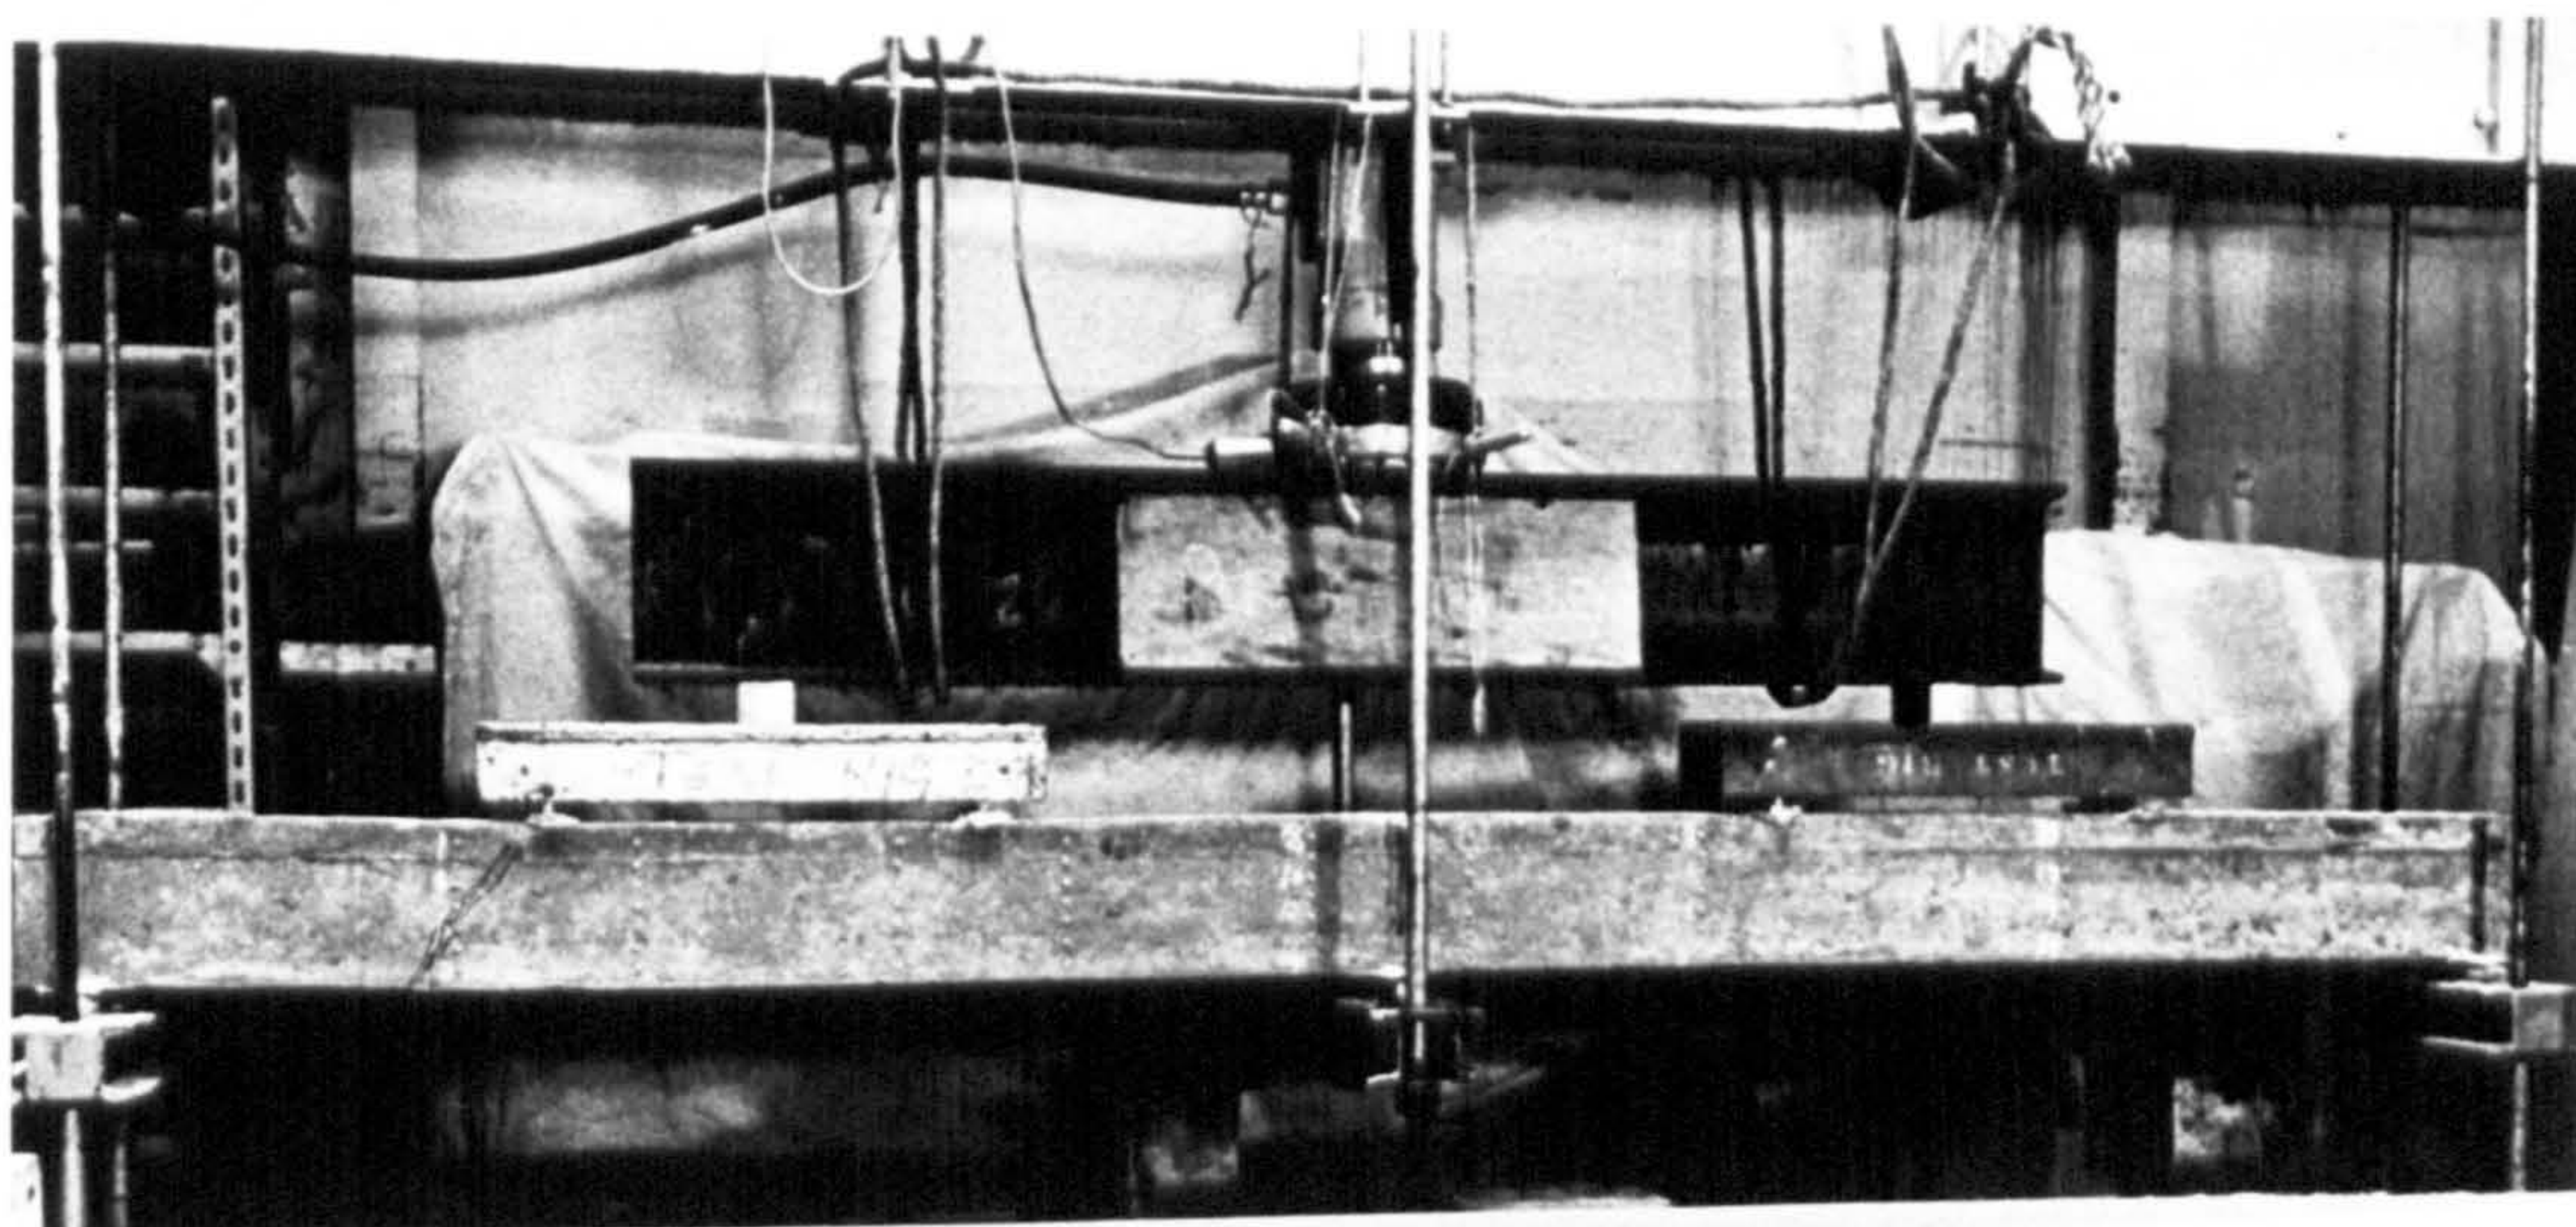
Prestressed concrete continuous beam on testing rig after failure
